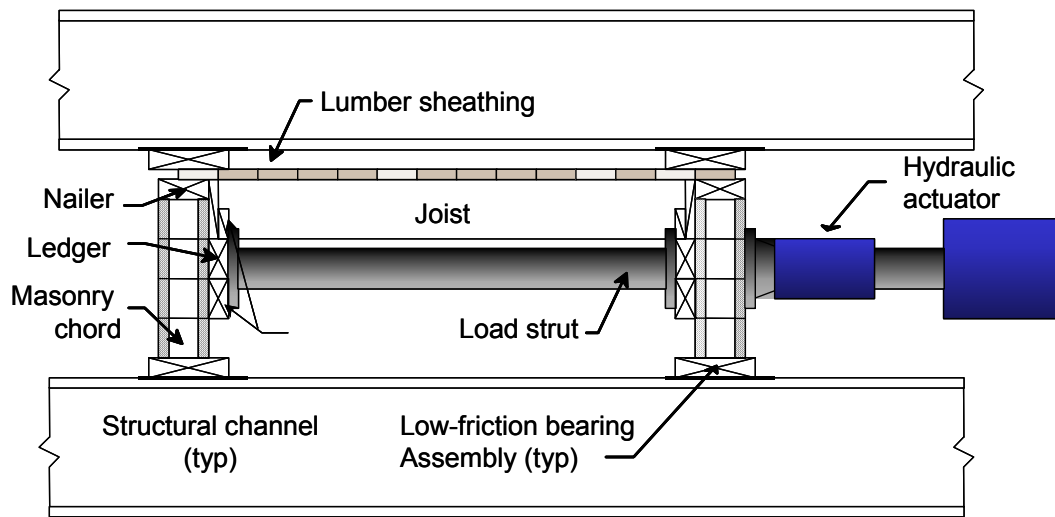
Typical cross-section of test setup near loading points (Diaphragm #1)
